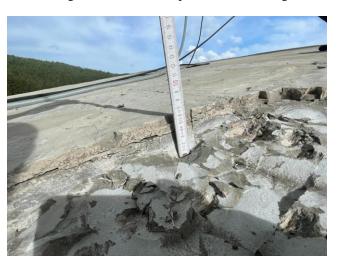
Damaged area with heavily segregated concrete structure.
